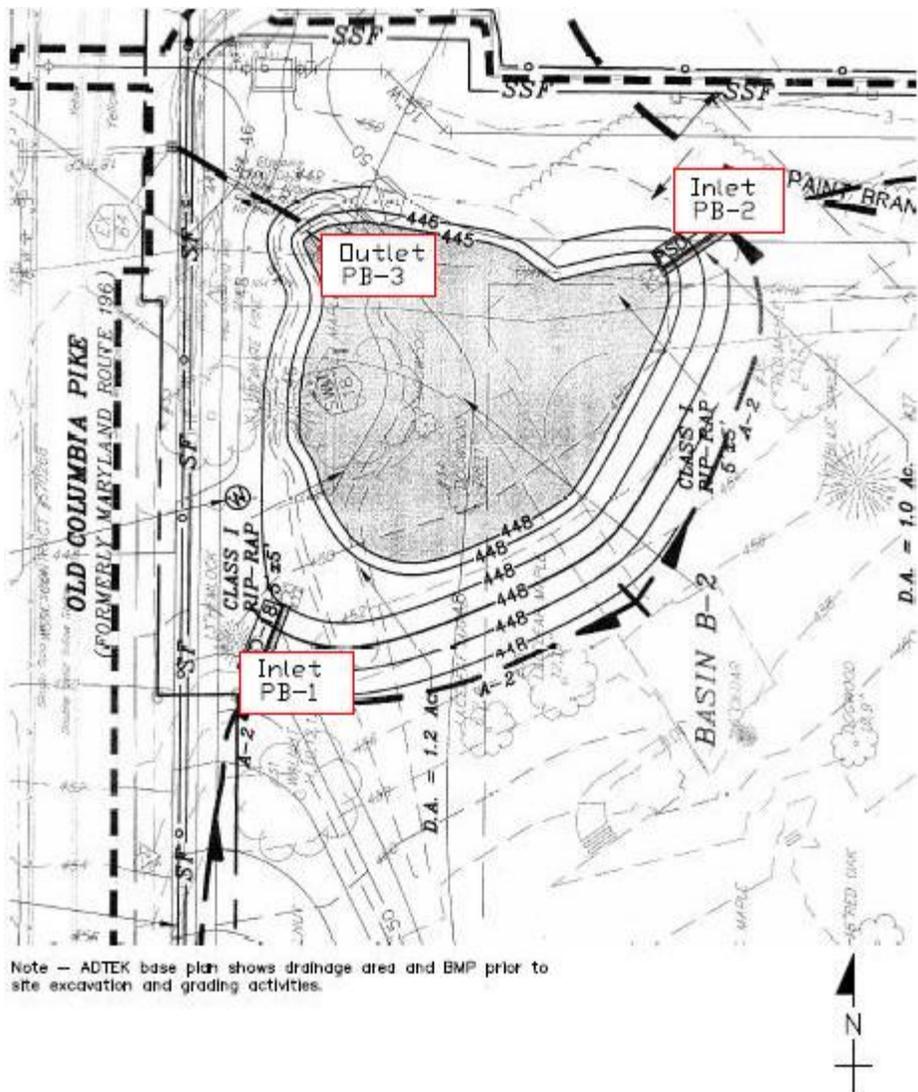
Plan view and sampling locations of Paint Branch High School Sediment Basin #2 (Schnable 2010).
